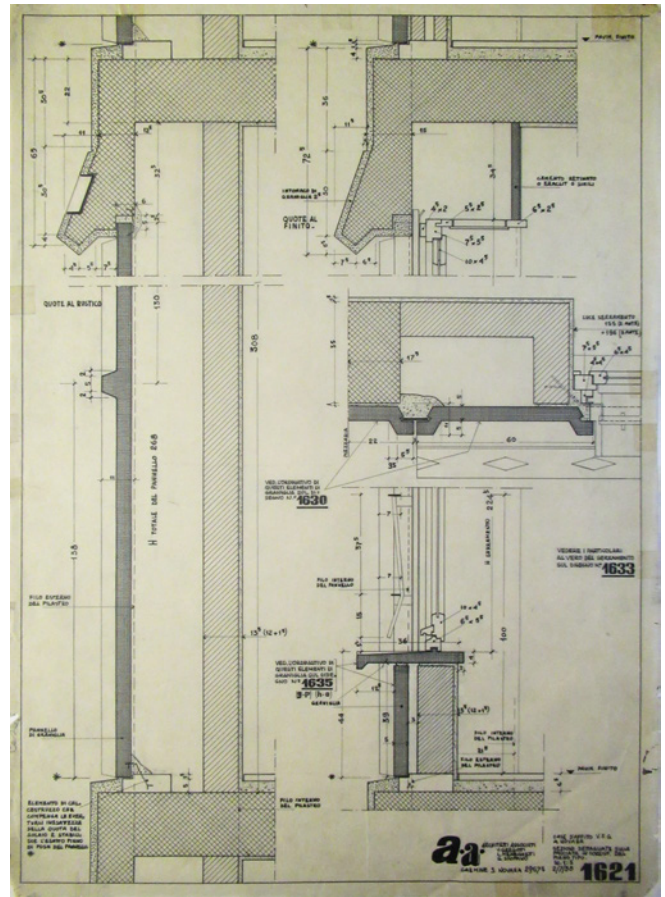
The VFG buildings, Novara, 1957–60. Detailed sections on the façade, 1:5 scale, 2 July 1958. (CASVA, AA archive collection, drawing no. 1621).
